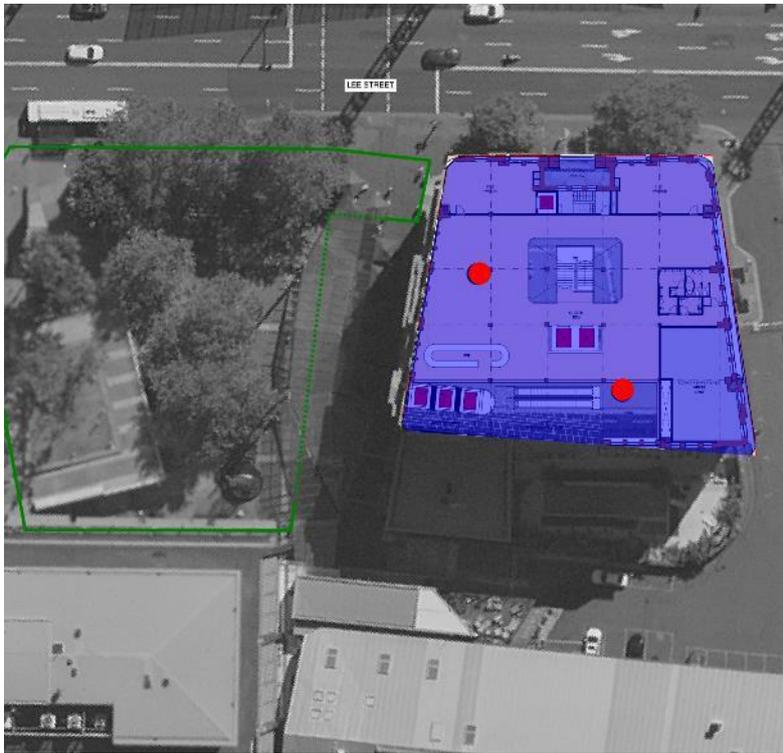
Elevation view of fPPb megacolumn installation shown in red
